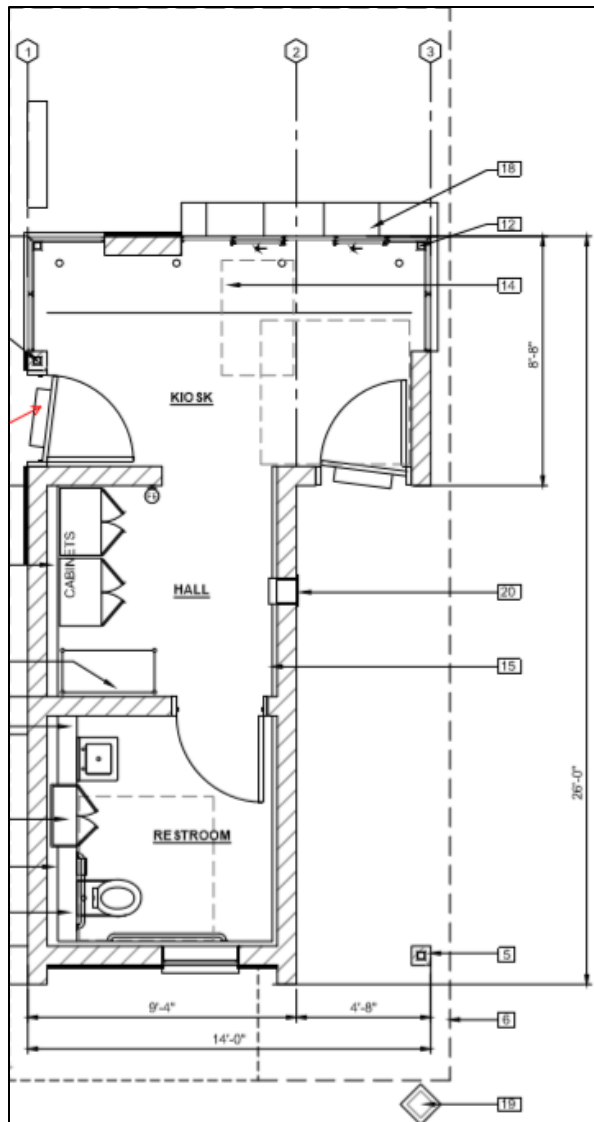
Proposed Kiosk Floor Plan, as shown in Appendix A5
